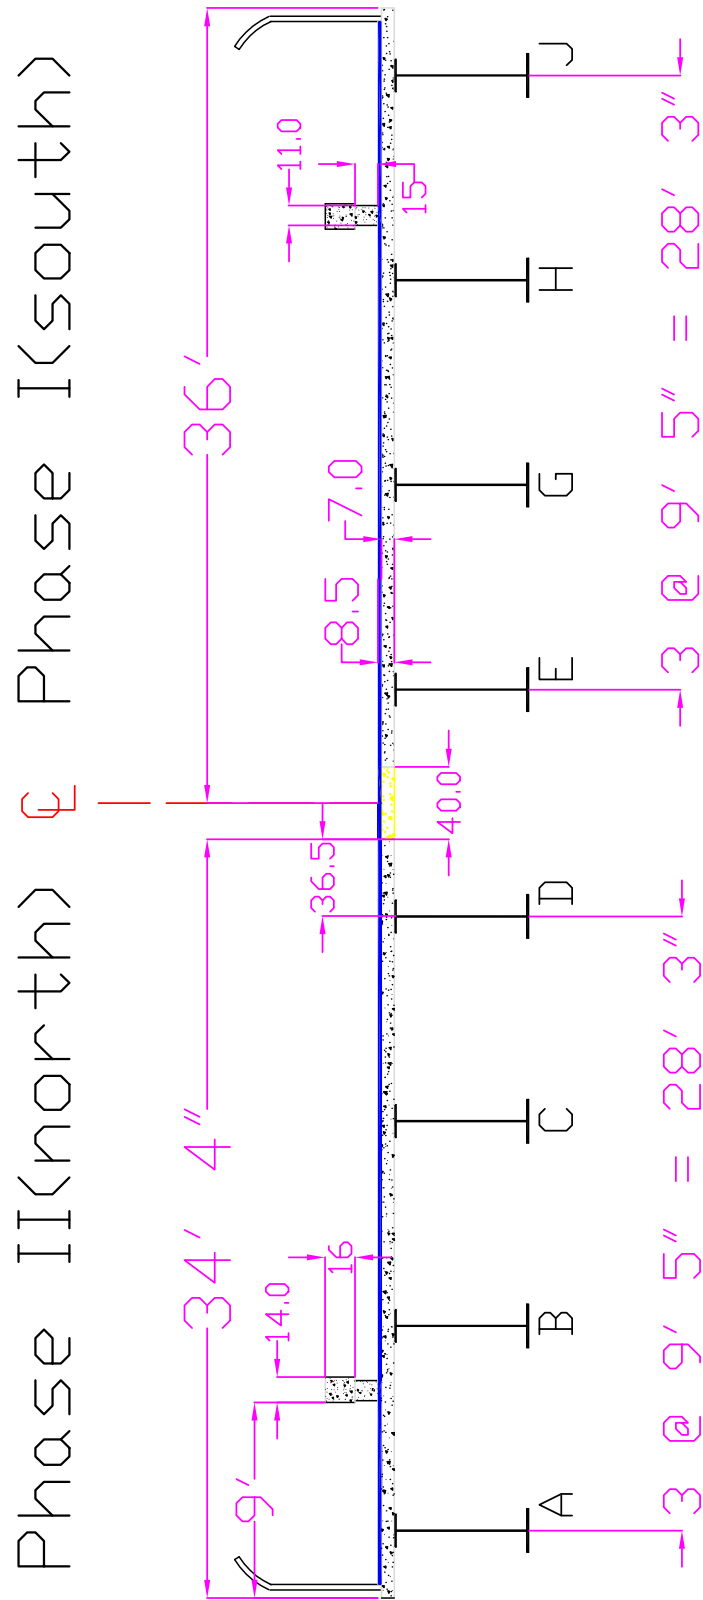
Completed bridge cross section. Note the phases are symmetric about the centerline. All dimensions are inches unless noted otherwise.
